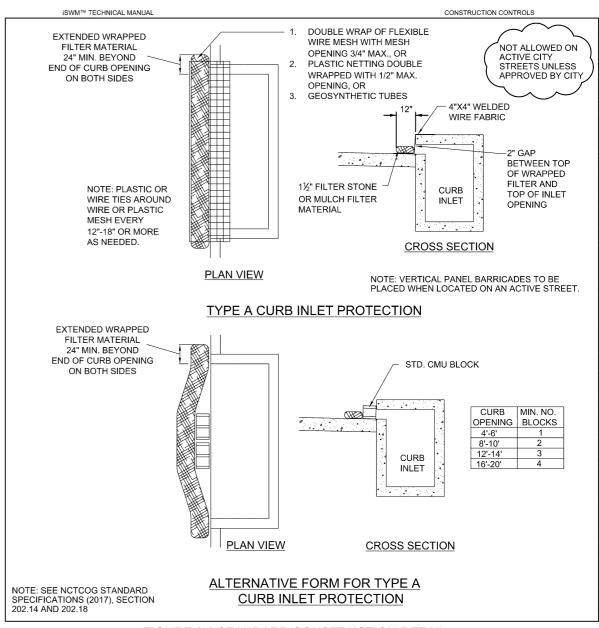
STANDARD CONSTRUCTION DETAIL - FILTER TUBE CURB INLET PROTECTION
